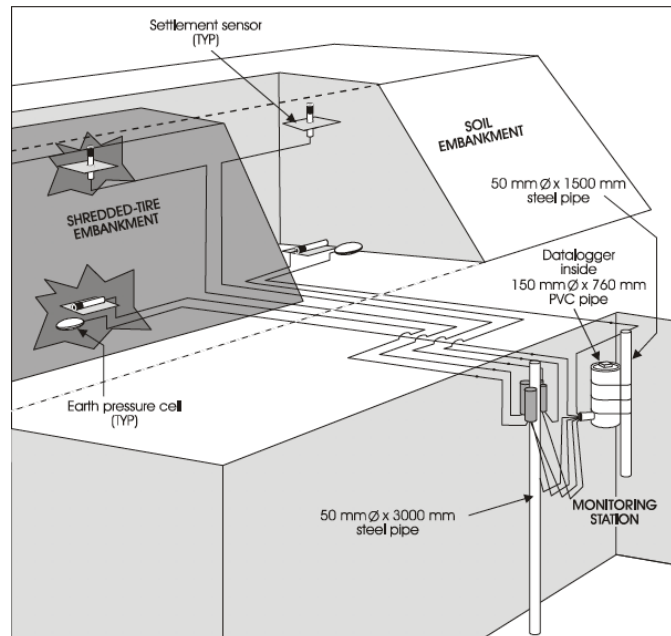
Instrumentation Setup at the Embankment Located in Site Location.
